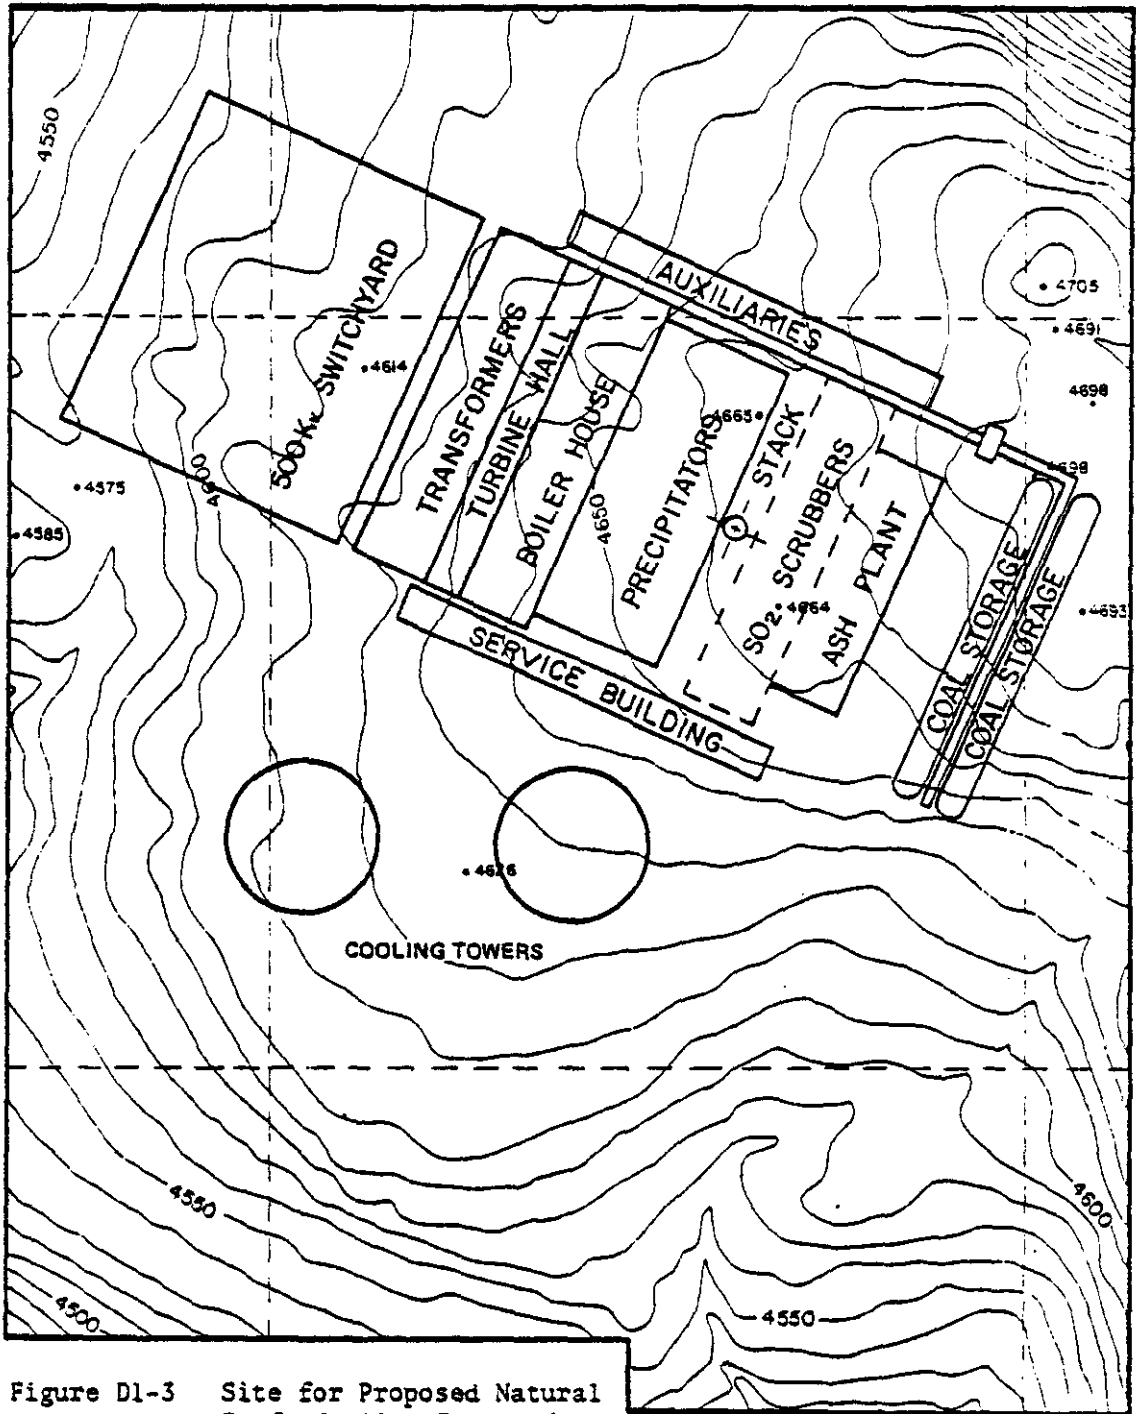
Site for Proposed Natural Draft Cooling Towers (Two Towers) Relative to Other Power Plant Installations
